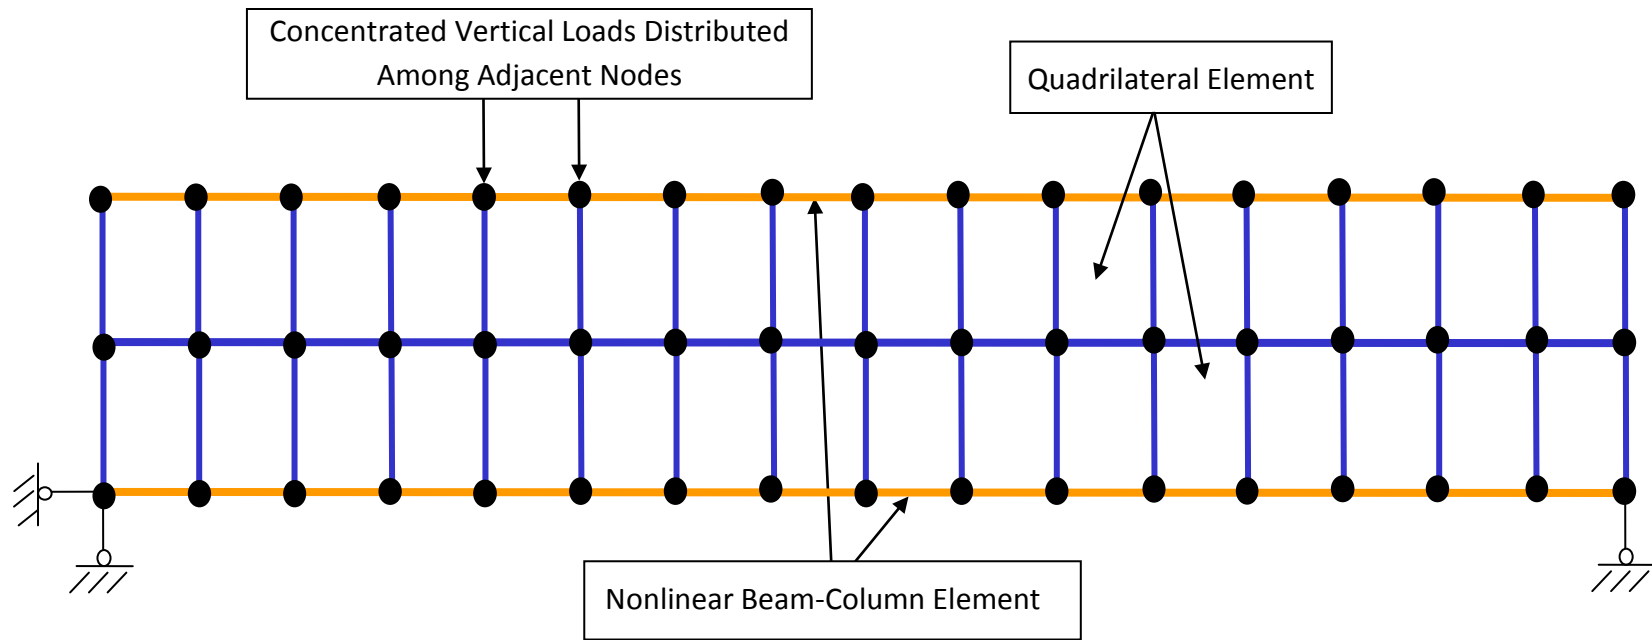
Finite Element Mesh of Girder Specimens E1 and E2
